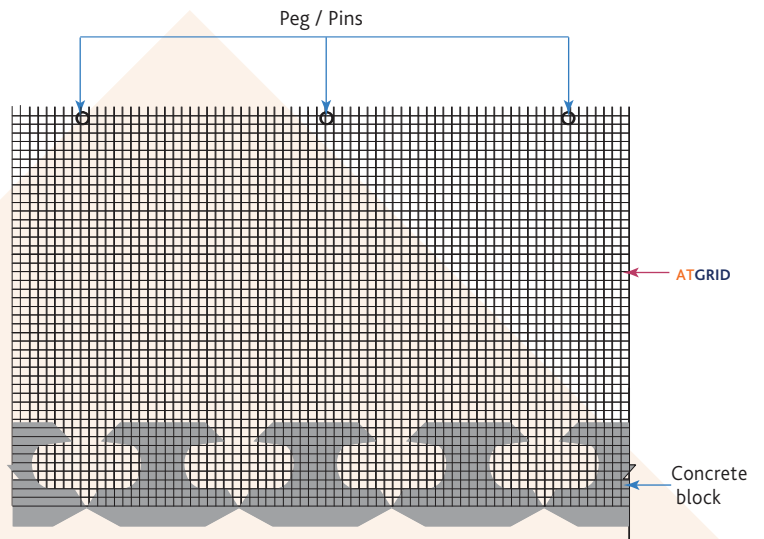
B Plan view of RS Wall with block fascia & ATGRID
